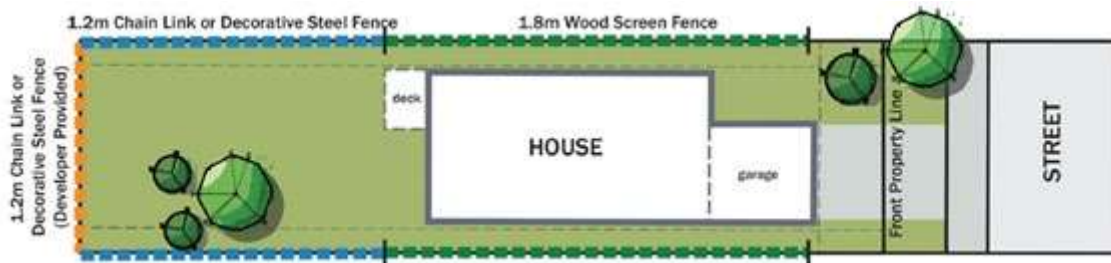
Fencing Plan – Stormwater Management Facility, Neighbourhood Parks and Walkway Lots
